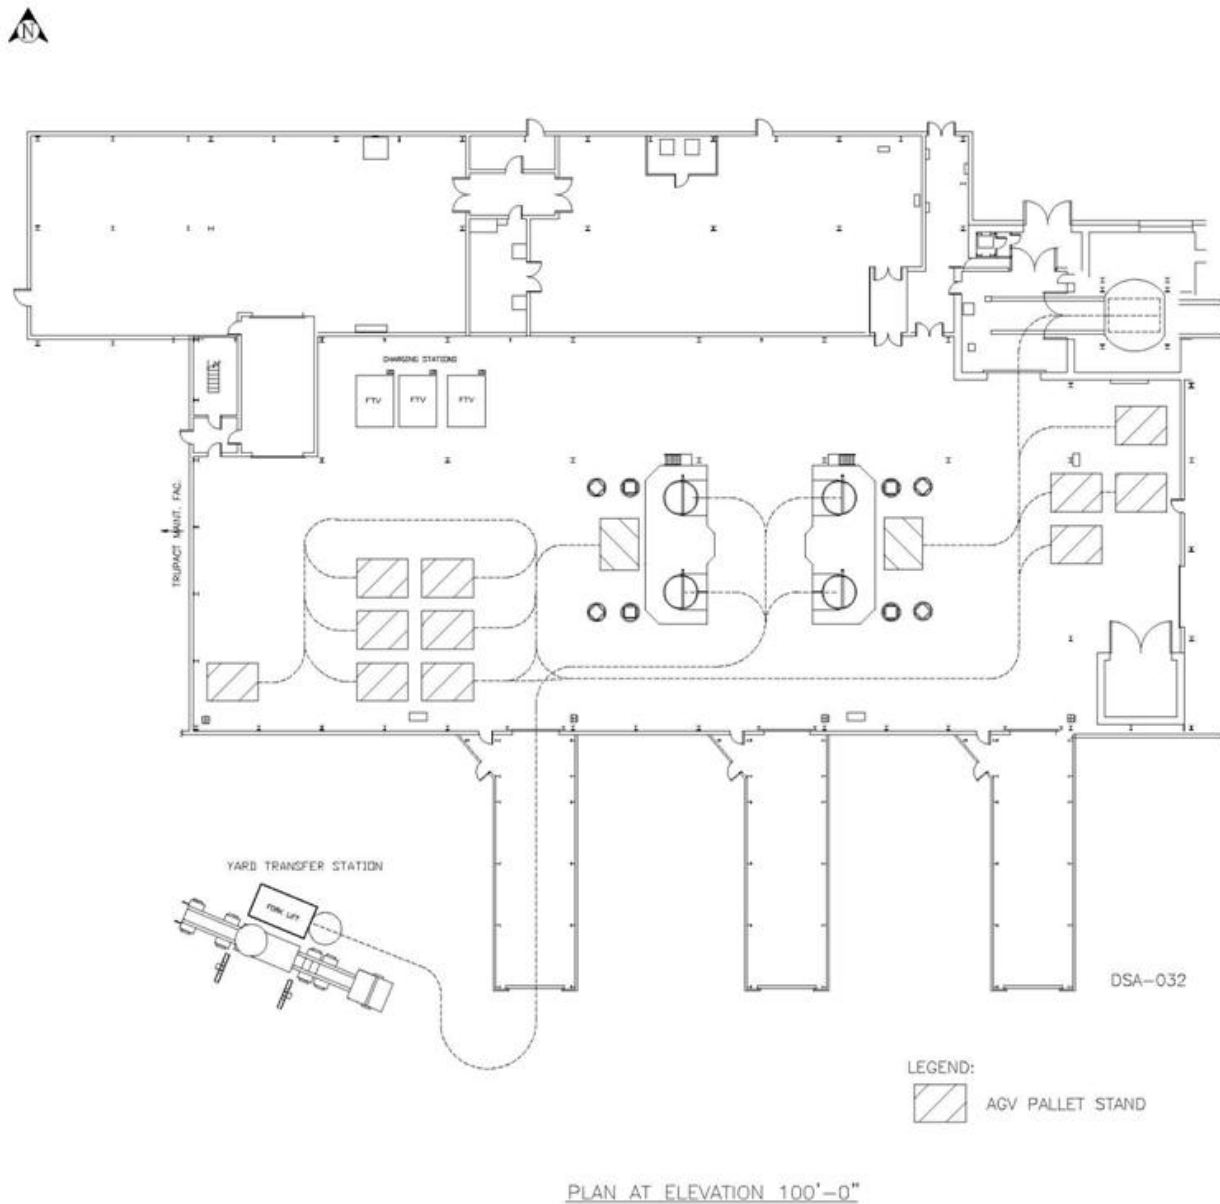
Contact-Handled Waste Transport Routes in the Waste Handling Building
